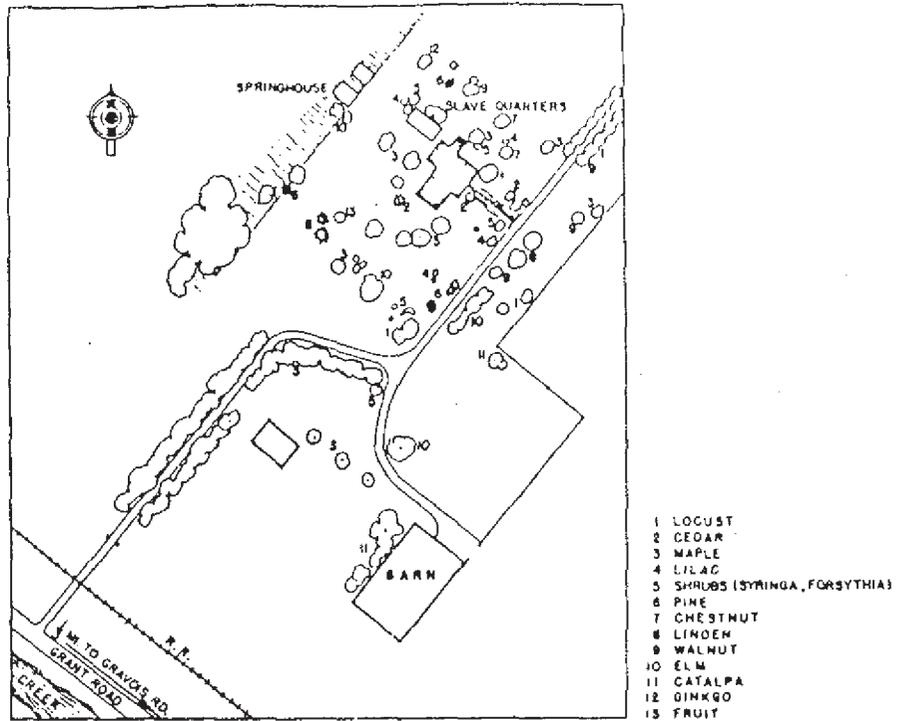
Cover sheet of 1940 HABS drawings showing plan view of White Haven.
